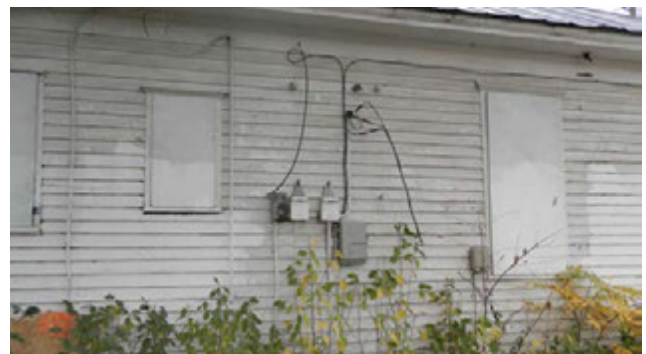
View of east wall siding, 2020 (source: Ratio)
